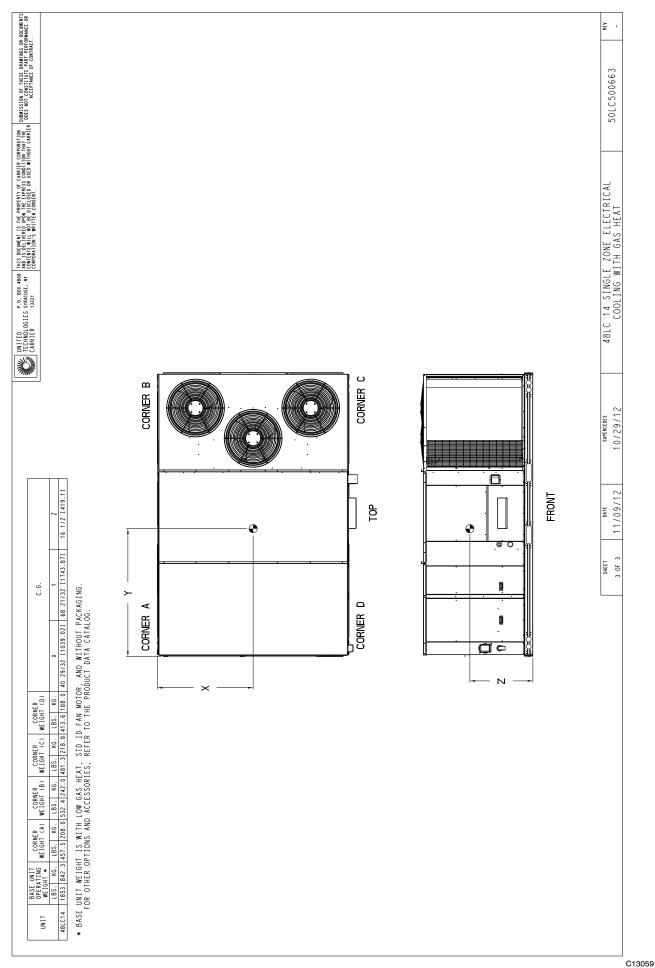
(cont.) - Unit Dimensional Drawing – 14 Size Unit, Sheet 3 of 3
